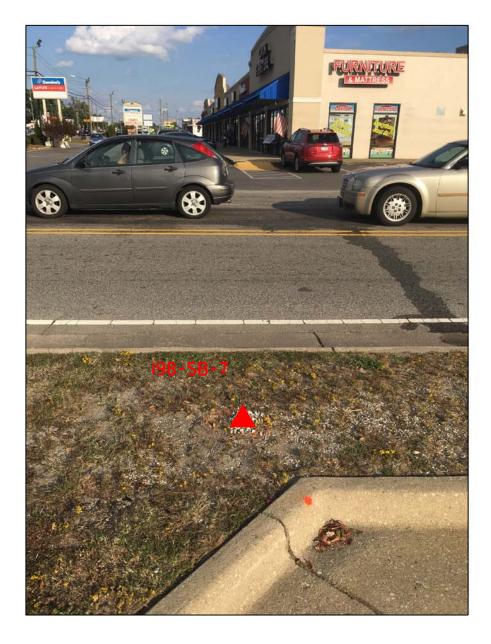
VIEW OF SOIL BORING LOOKING EAST
